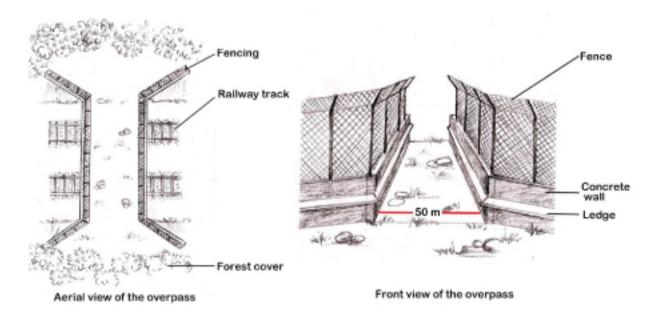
Aerial and front view of overpasses on railway tracks, with fencing/noise and sound barrier details.
